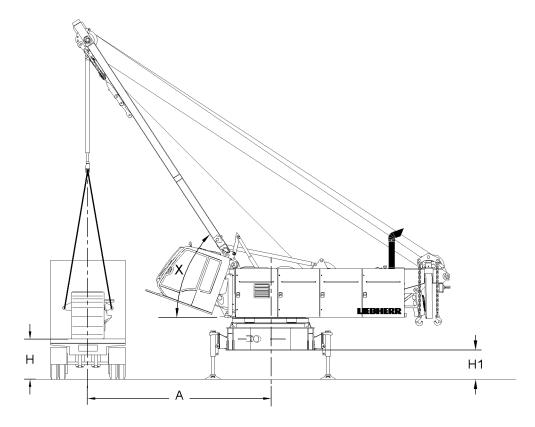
Limit values - unloading and fitting the first crawler side frame
